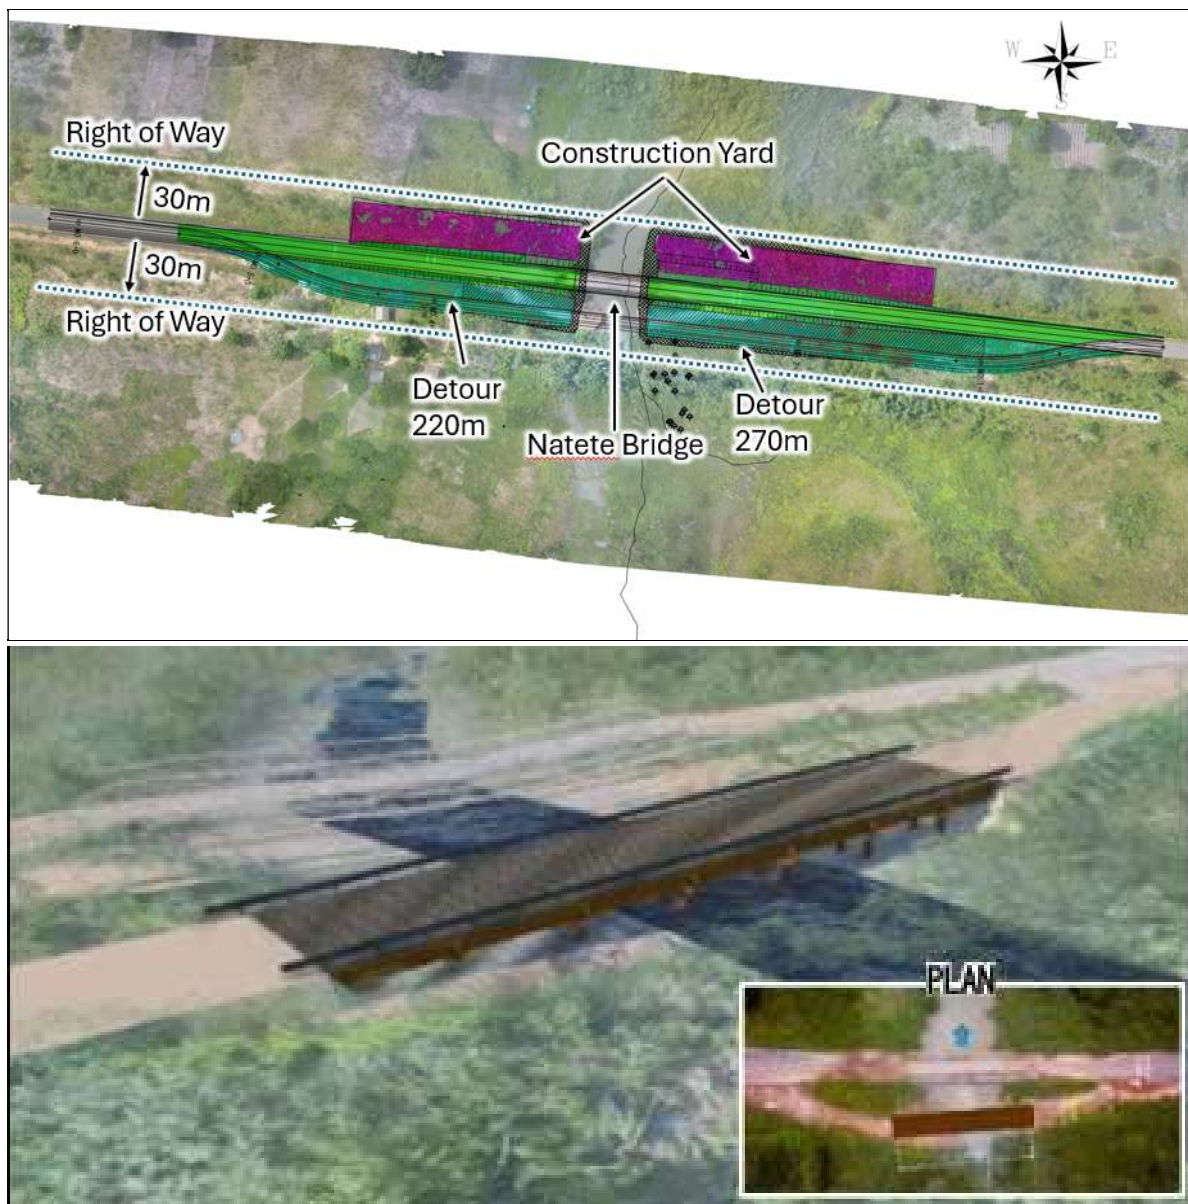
Layout of Bypass Roads and Construction Yard.
